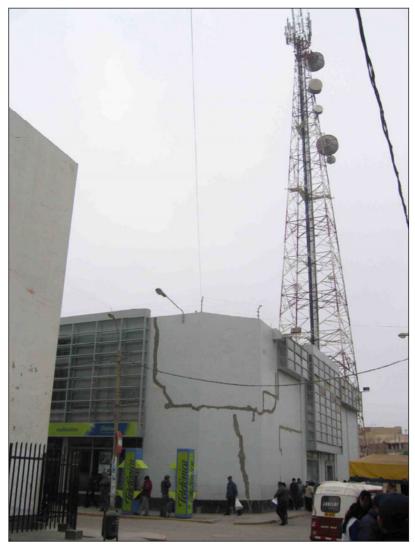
Telefónica central office in Ica City. Surface cracks on the outside wall were fixed.
